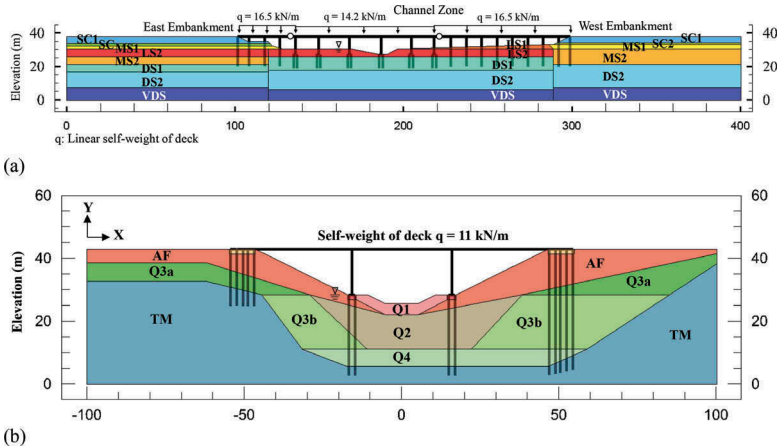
Ground configuration: (a) Bridge 1; (b) Bridge 2.
